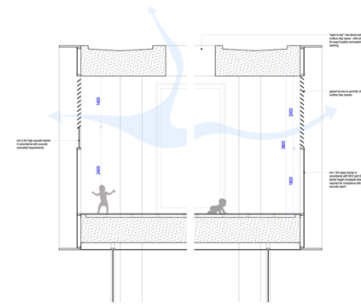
Typical Outdoor Play Space Façade Details indicating ventilation, acoustic and climability requirements.
